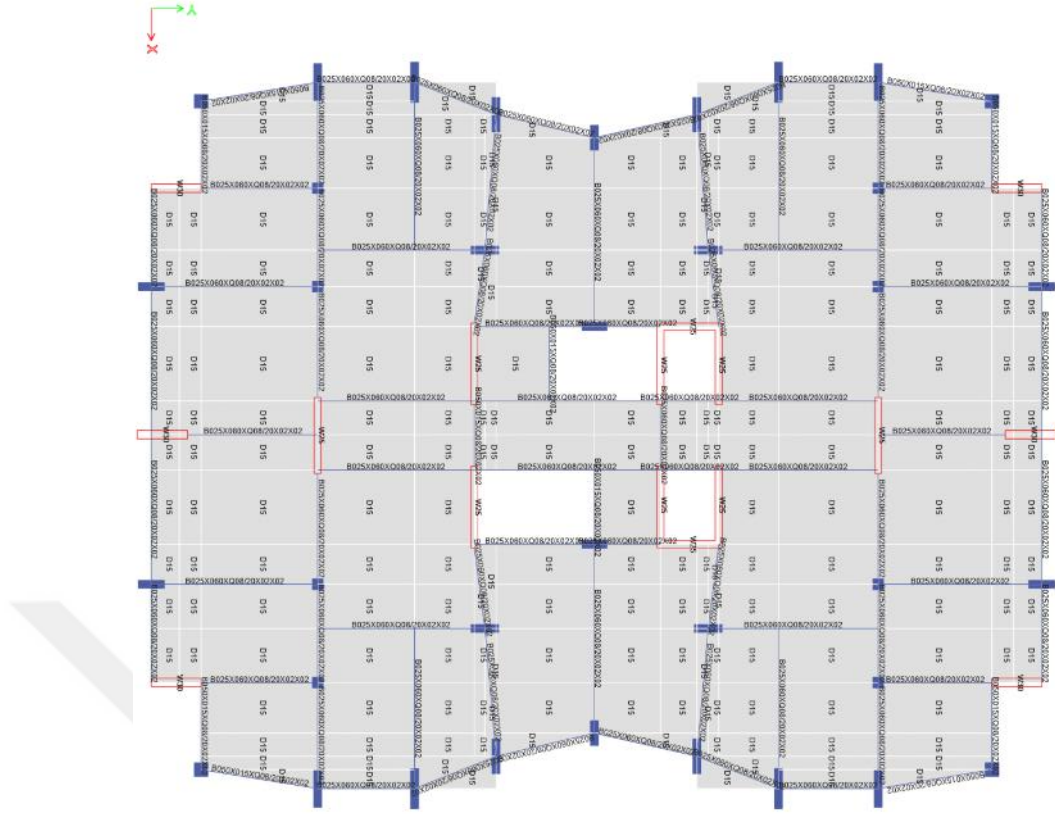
Formwork plan and element sections for the 1st Floor and above.
